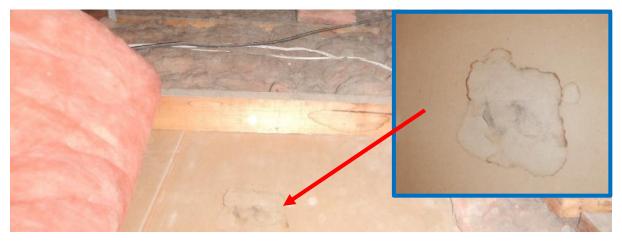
shows watermarks/mould along the internal side of the plasterboard ceiling linings.
